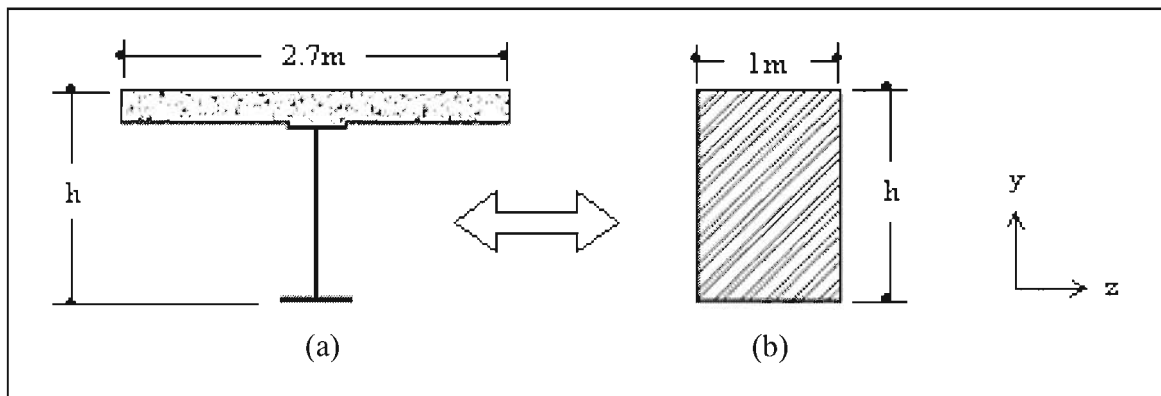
Cross-sections of (a) actual girder and (b) model girder
